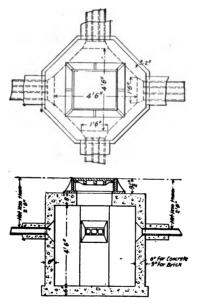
Vault Size 2 to be Used on Runs of 1 to 3 Ducts of Conduit when Intersected.
